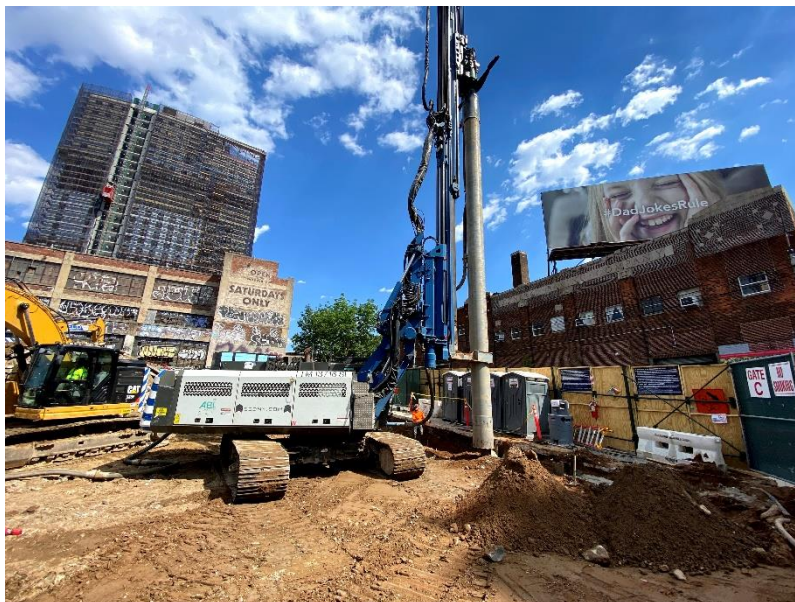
View of ECD installing soldier piles for the support of excavation (SOE), facing southeast.
